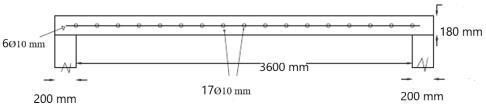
Details of the supporting walls, reinforcement and slabs after casting
